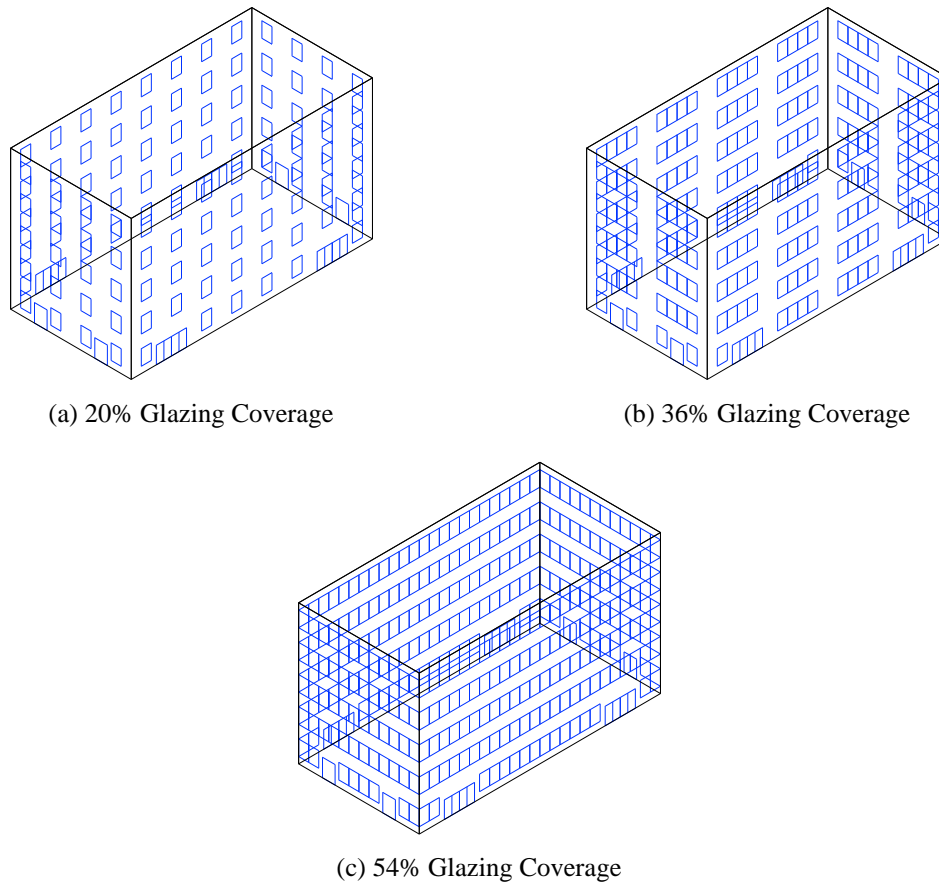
Modeled Five-Story Fully-Engineered Buildings.
